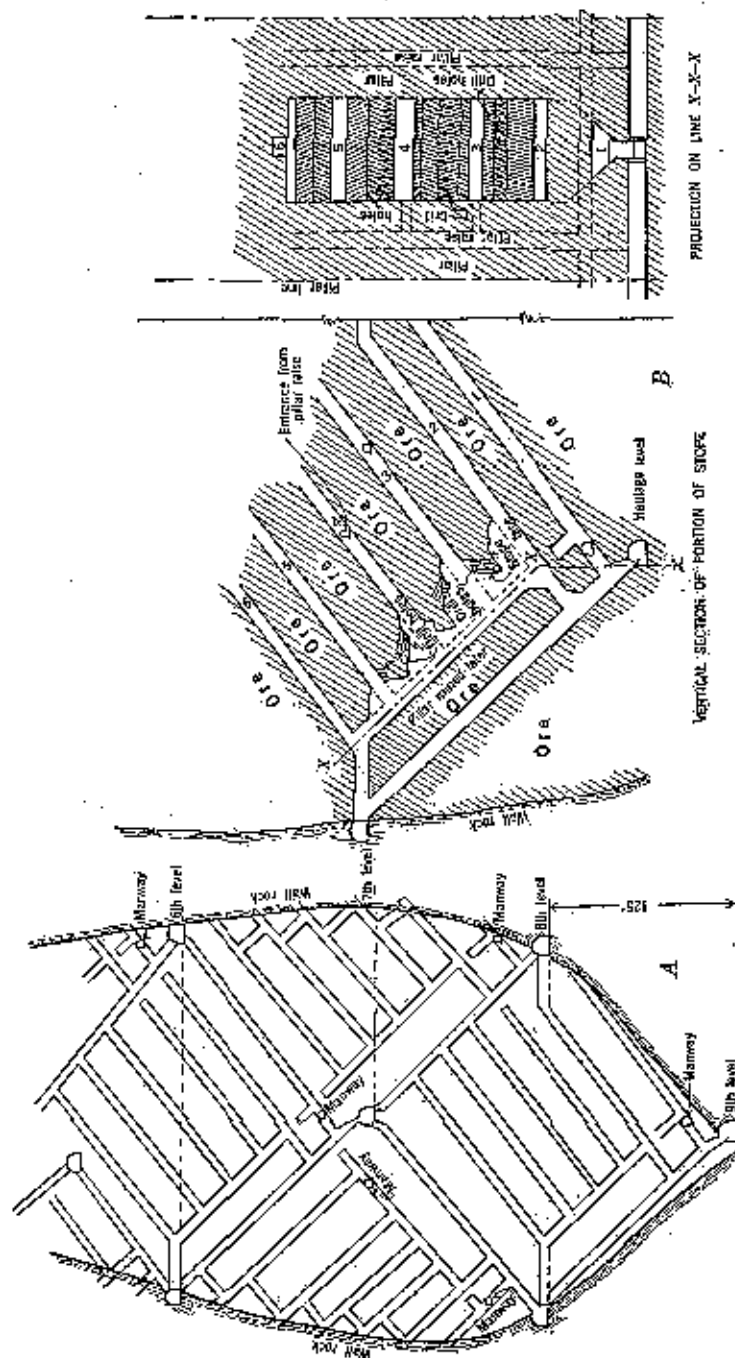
Open stoping at Haque mine, Normanda, Quebec: A, Vertical section through fully developed stoping area; B, method of open stoping from inclined slope raises; C, method of open stoping from inclined slope raises.
